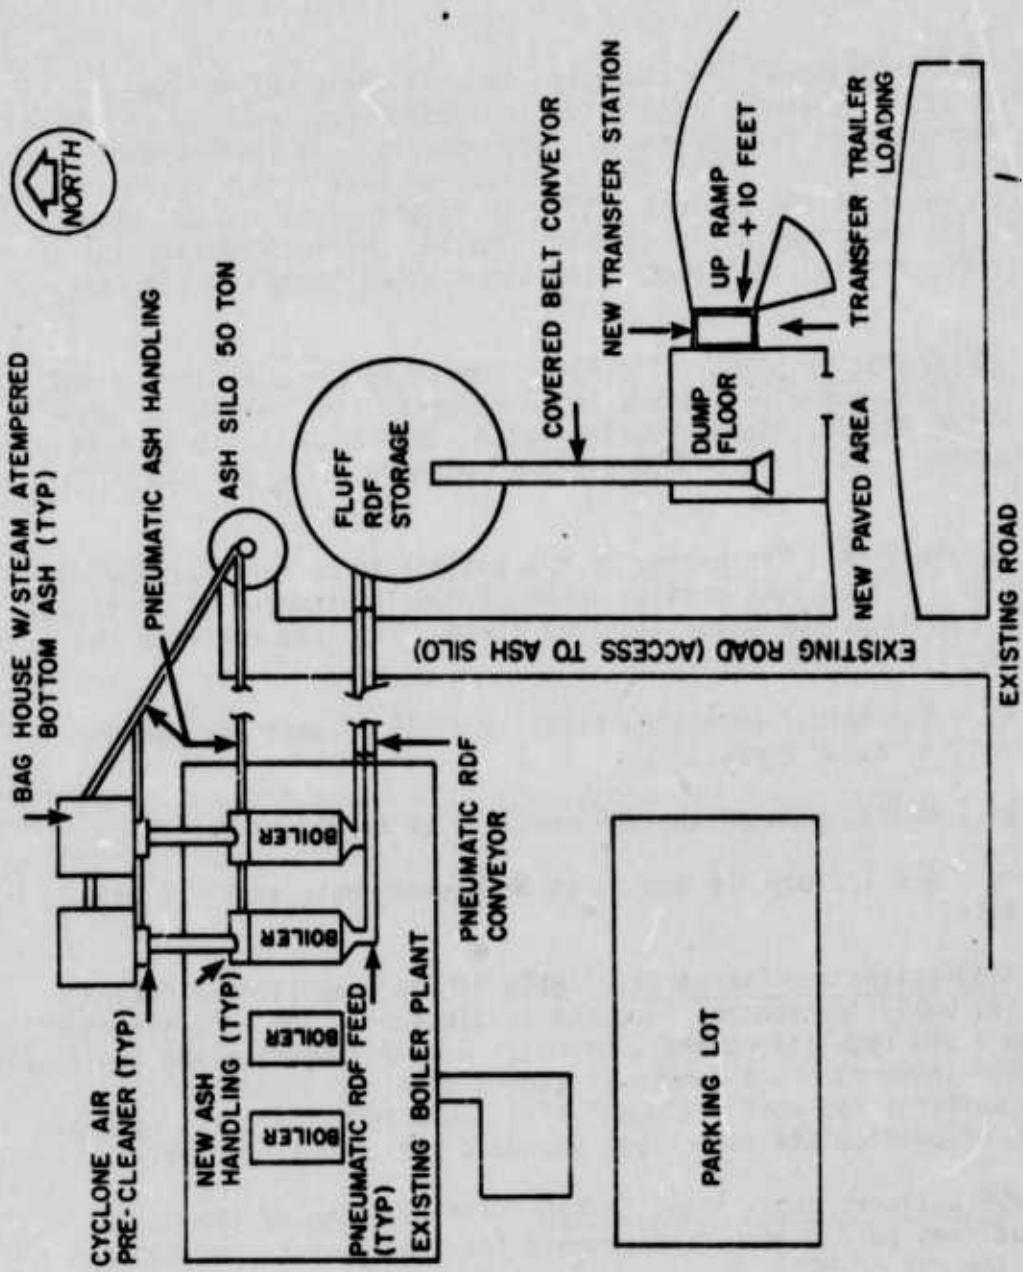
Site plan for use of RDF at Fort Monmouth (not to scale).
